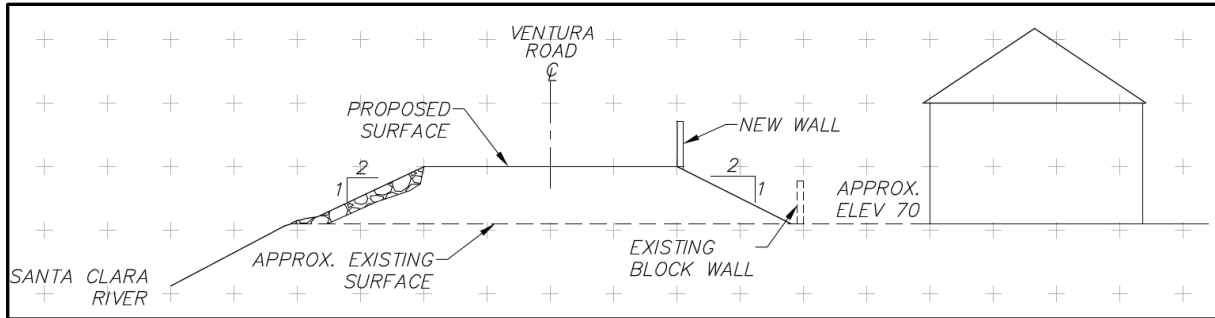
Cross-section at east end of N. Ventura Road with Raised Roadway (VCWPD, 2014)
